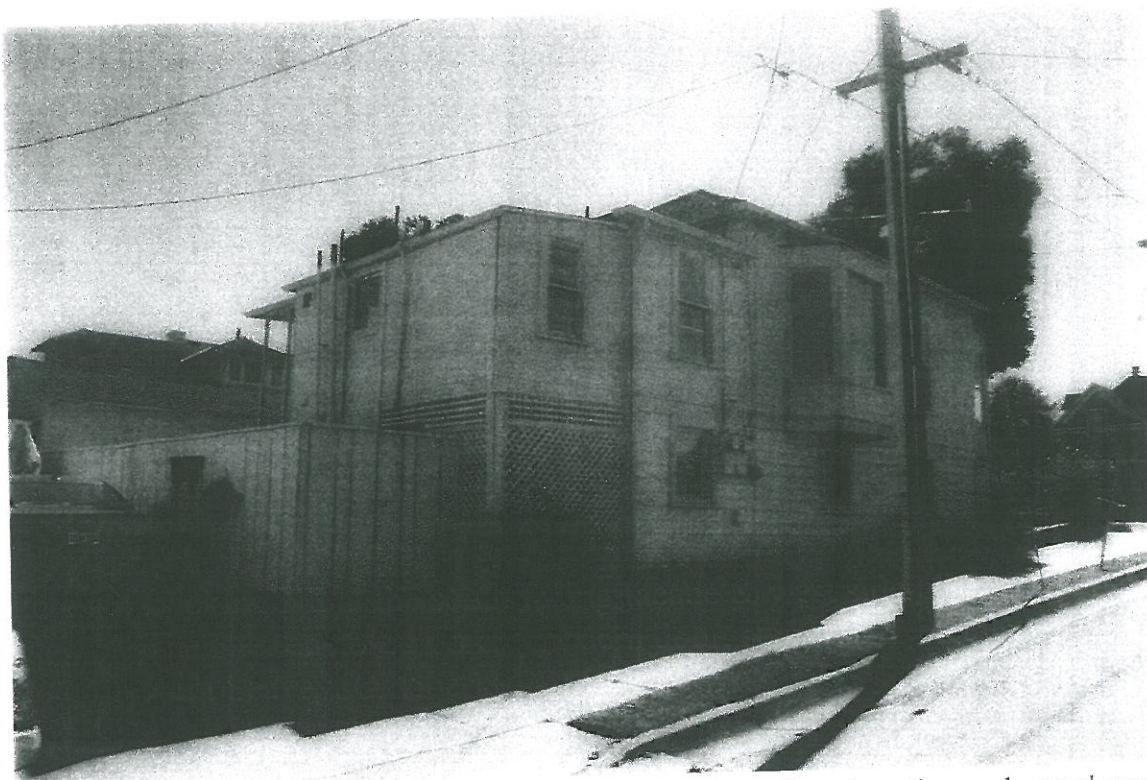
Looking SE at the rear (north) elevation showing the awkward enclosed porch addition & dead space below, Kent Seavey, October 8, 2016.
